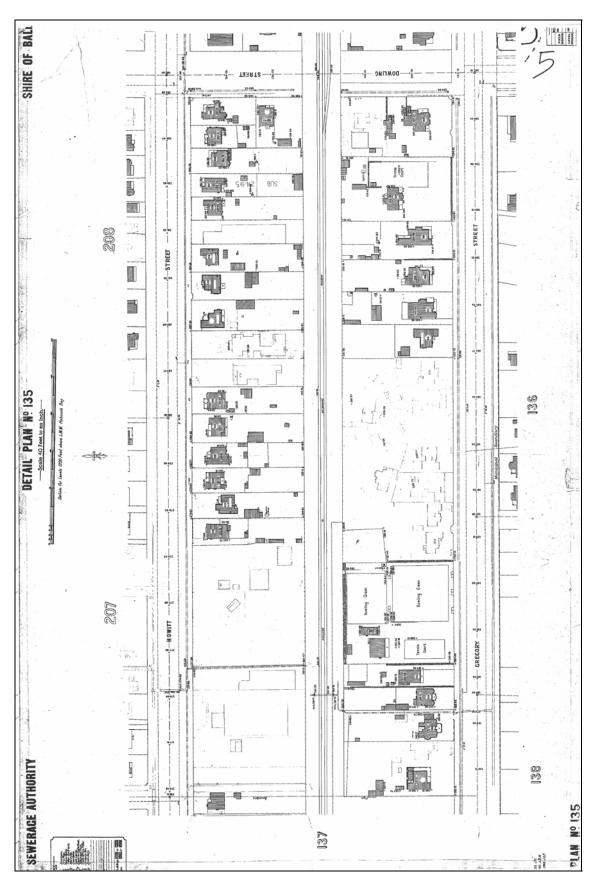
Ballarat Sewerage Authority Plan, 1940. Source: Planning Department, City of Ballarat.
